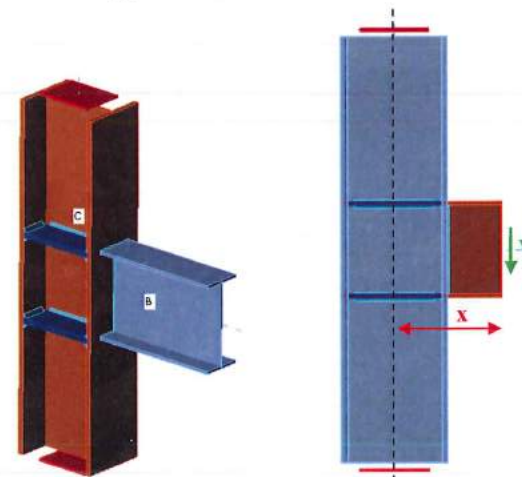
Benchmark example of the welded beam to column joint with force eccentricity
